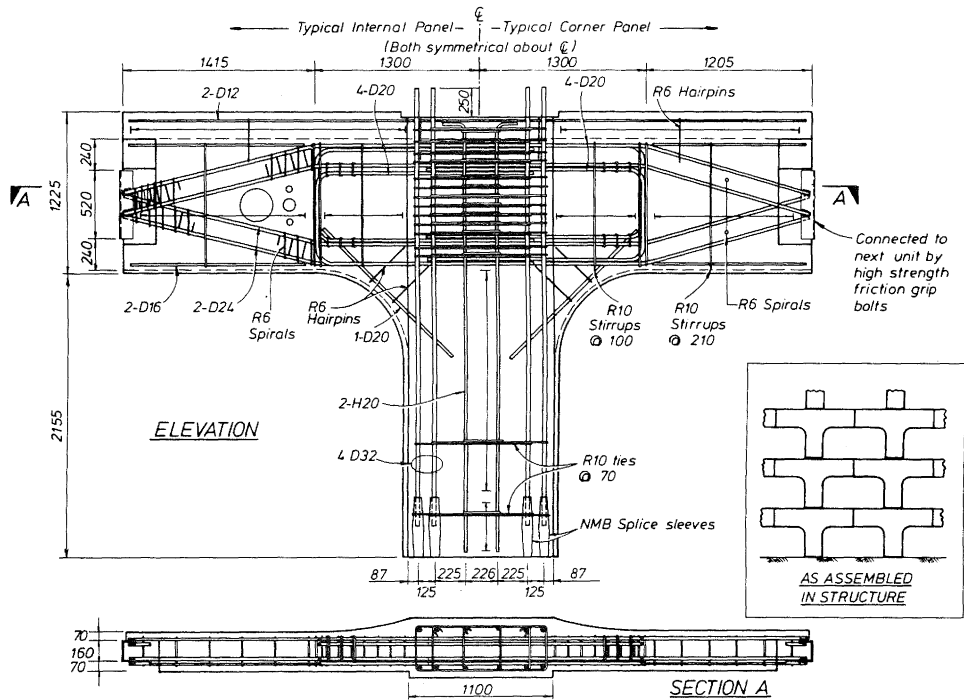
PRECAST BEAM-COLUMN UNIT
